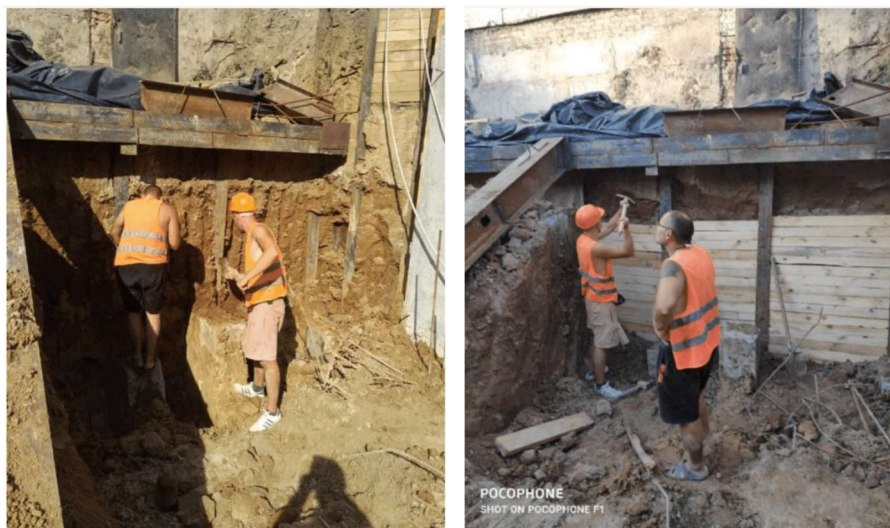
Photo of the excavation shoring installation near the existing 5-story building
